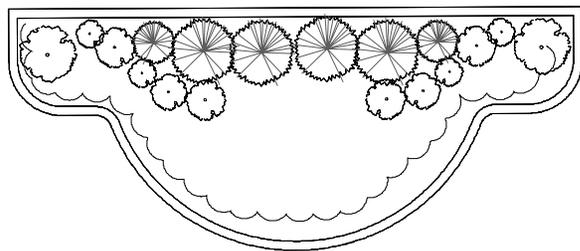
Perimeter Gateway and Floral Feature Entry Point Plan
